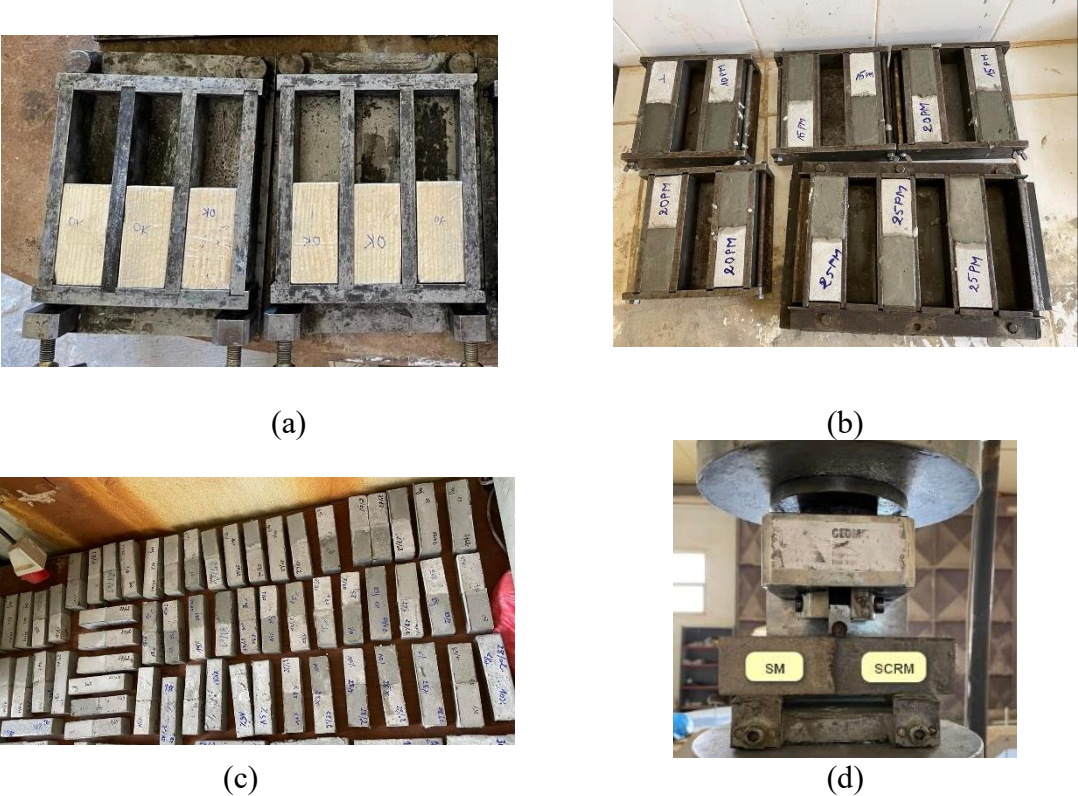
(a) Empty moulds, (b) moulds filled with repair mortar, (c) curing specimens and (d) flexural test.
